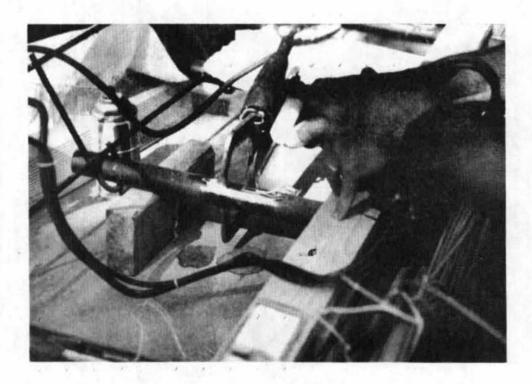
Welding a Sensor to the Dowel Bar
